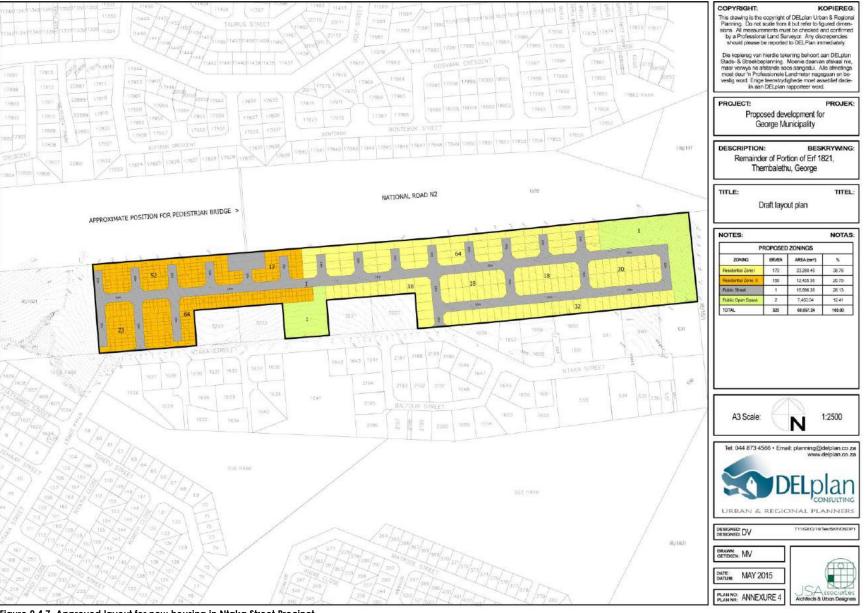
Approved layout for new housing in Ntaka Street Precinct.
